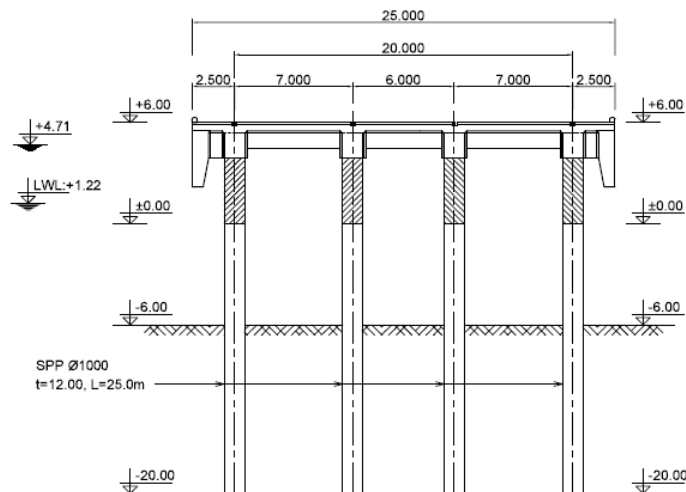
Typical Cross Section of the Discharging Berth
